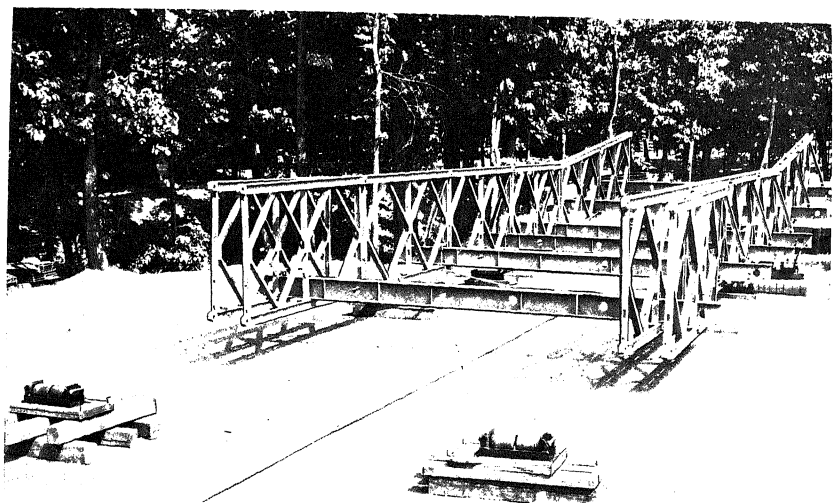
First bay, DS, assembly—outer truss panels added to first bay.
